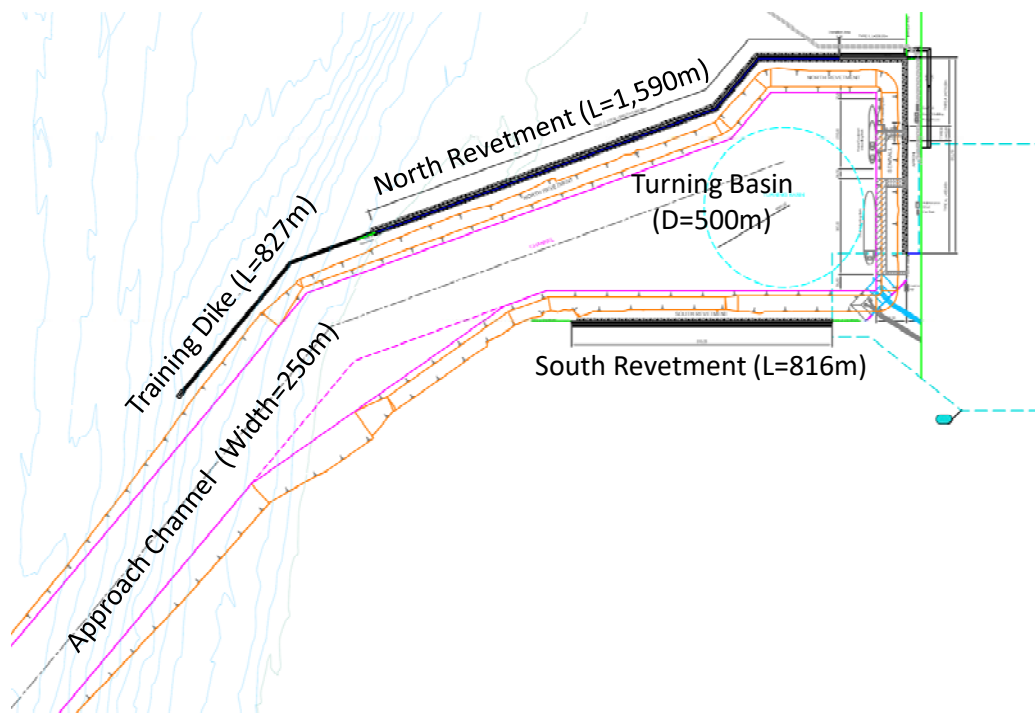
Original layout plan of port for Matarbari Power Plant
